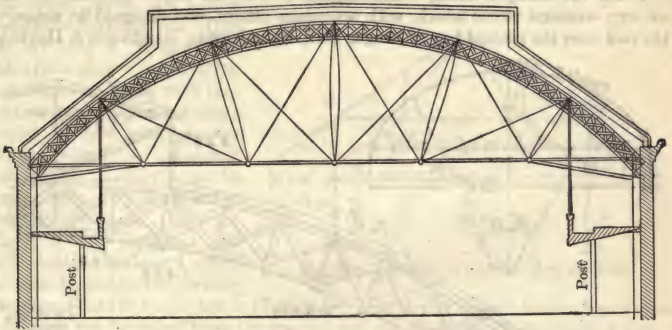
Arched Wooden Truss. City Armory, Cleveland, Ohio. Span 79 feet
